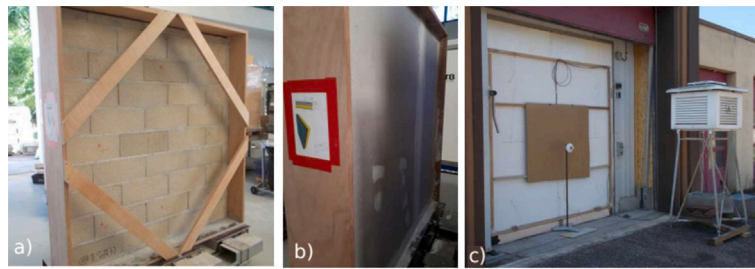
Tested internal insulation wall — construction phase: mounting of building blocks (a), adding insulation and plasterboard (b) and identification test phase at Cerema Nancy: view of the outside wall face, with a sun cover, exposed to natural conditions (c).
